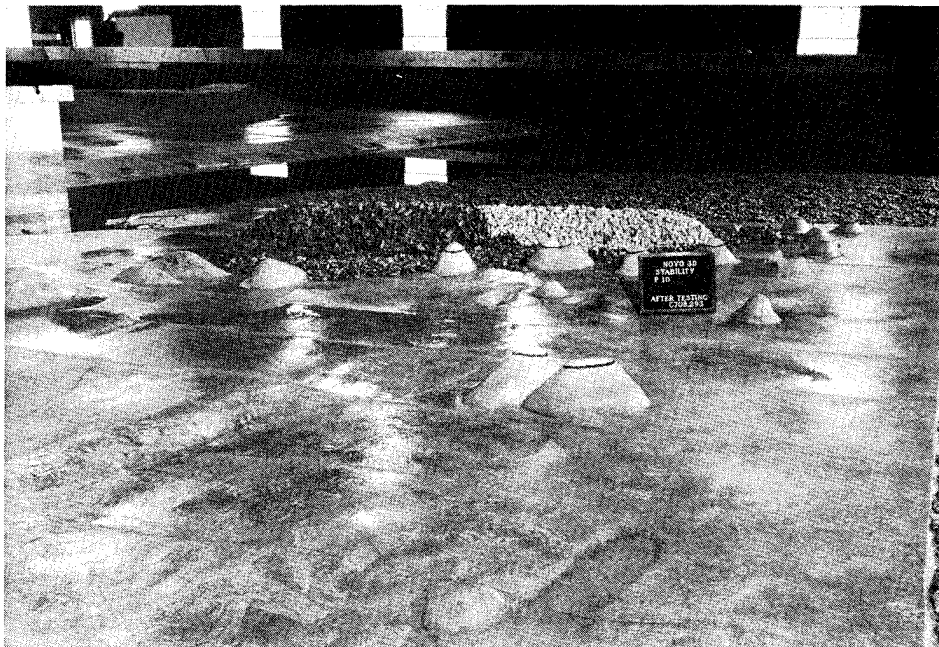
Sea-side view of Plan 10 after Storm IA waves
